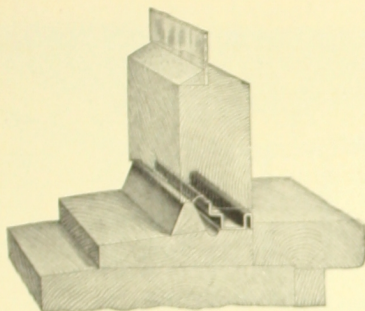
Cross-section thru sash and window frame at bottom showing installation of "Air-Way" track below sash and the tight application of sash. Note arched groove in bottom of sash just back of wood threshold, or storm sill—this groove obviates the possibility of moisture following the bottom of the sash.
